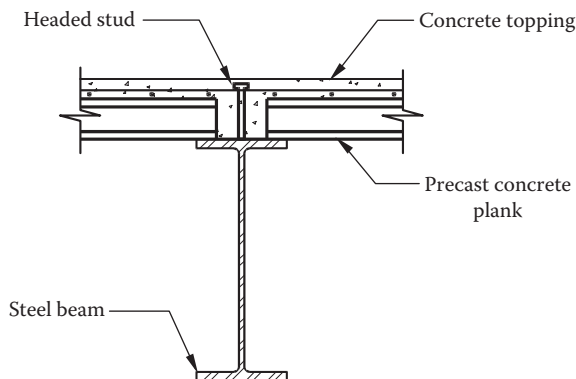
Composite beam with precast concrete plank and topping slab.
